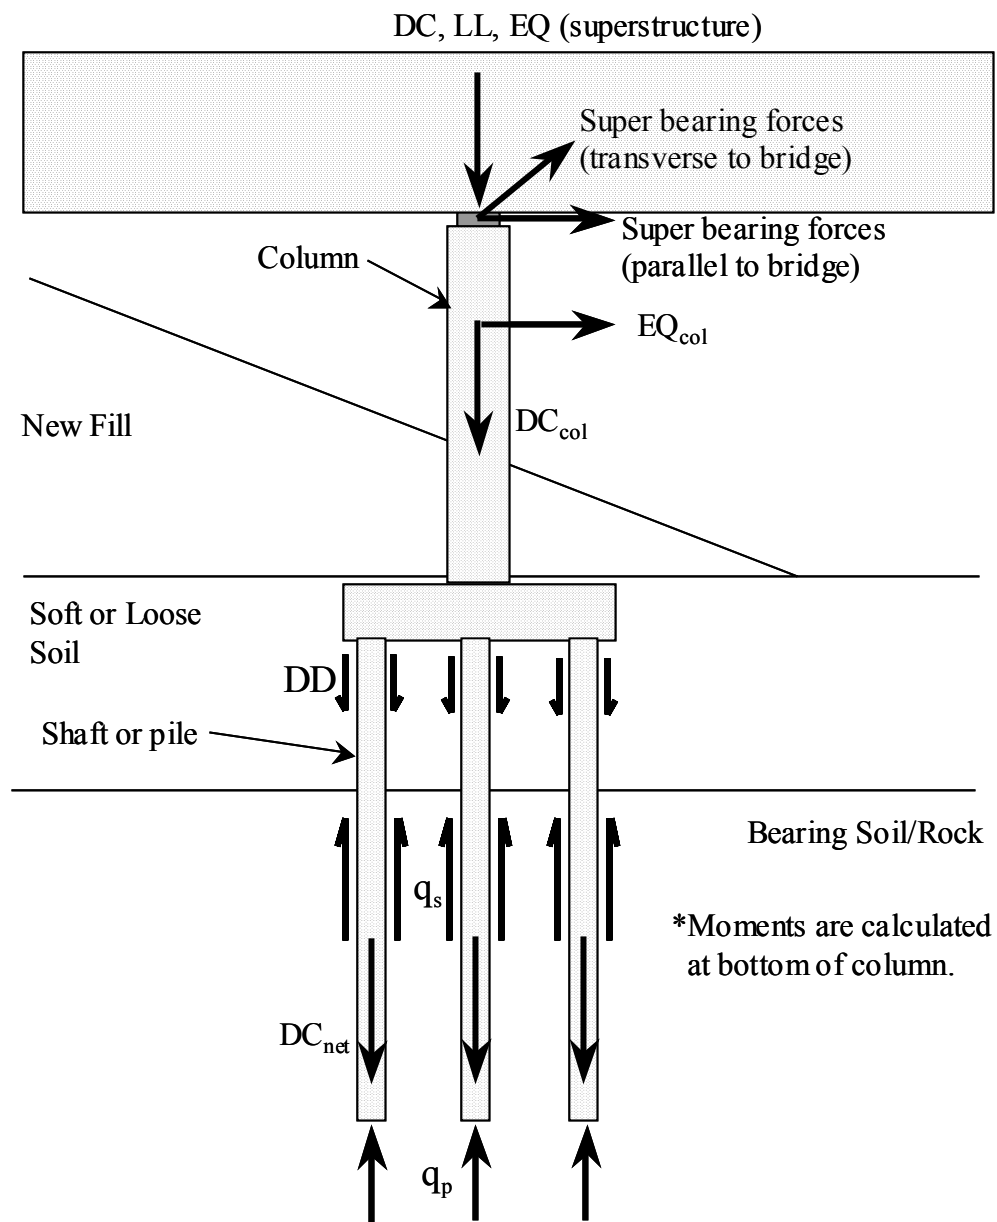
Definition and location of forces for pile or shaft supported footing.
